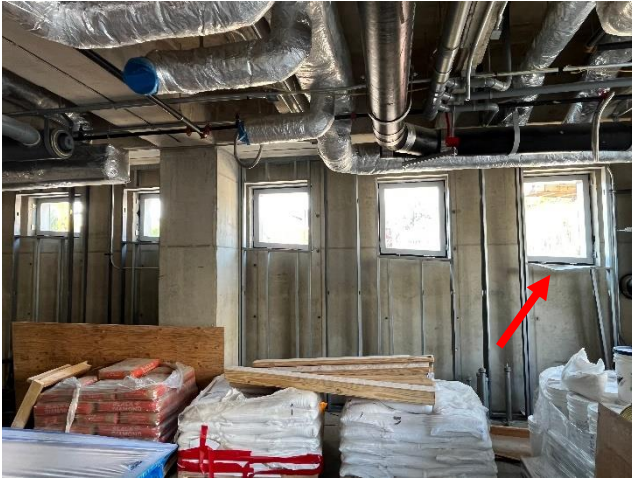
Interior view of Specimen 6 location at north elevation, ground level.
